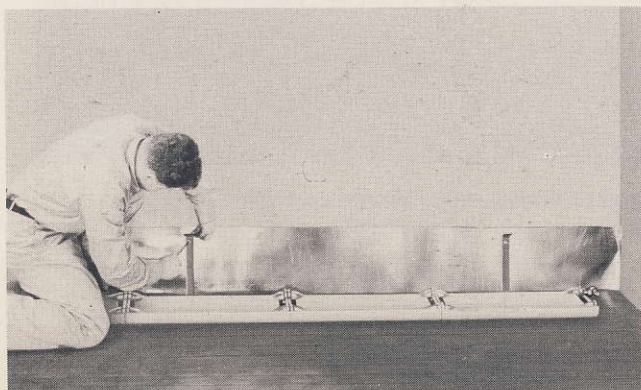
Wall brackets hold sealing strip of aluminum foil or non-asphalt paper in place.
